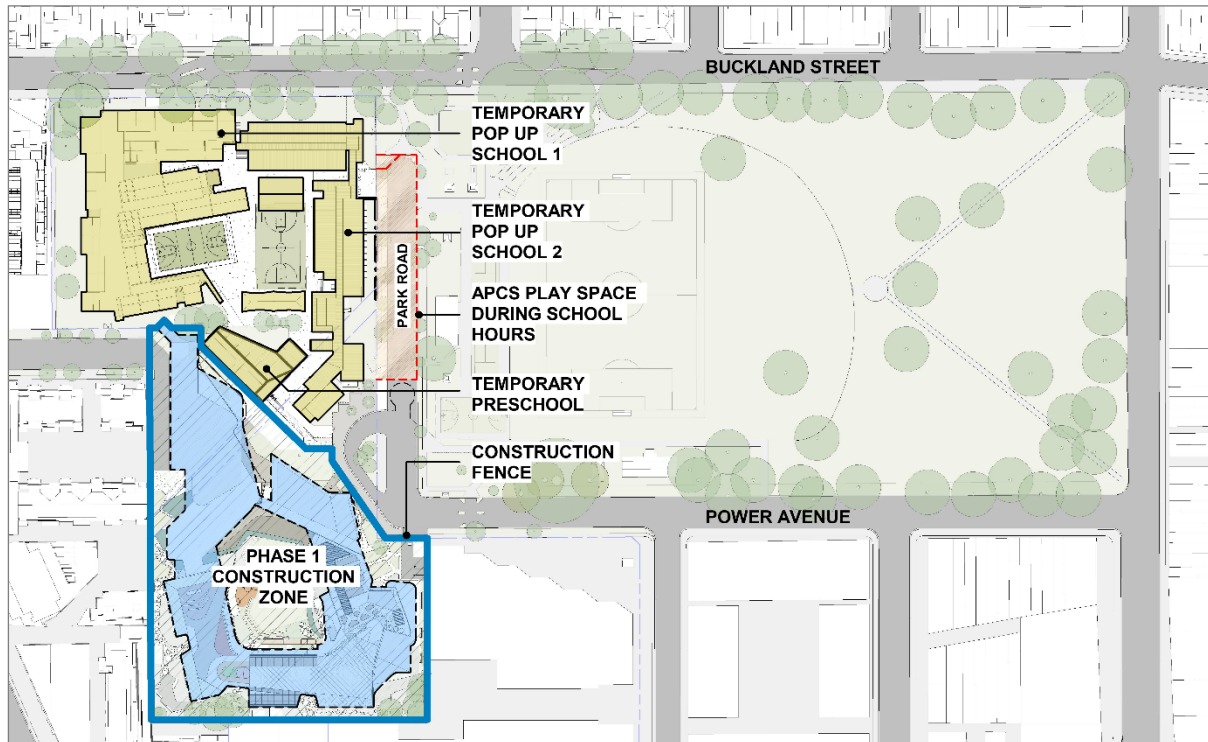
Site plan of Phase 1 showing construction of main works locating pop-up 1, pop-up 2, play space on Park Road, temporary preschool and the construction zone. (Image: Design | TKDArchitects. Source: Department of Education 2018)
